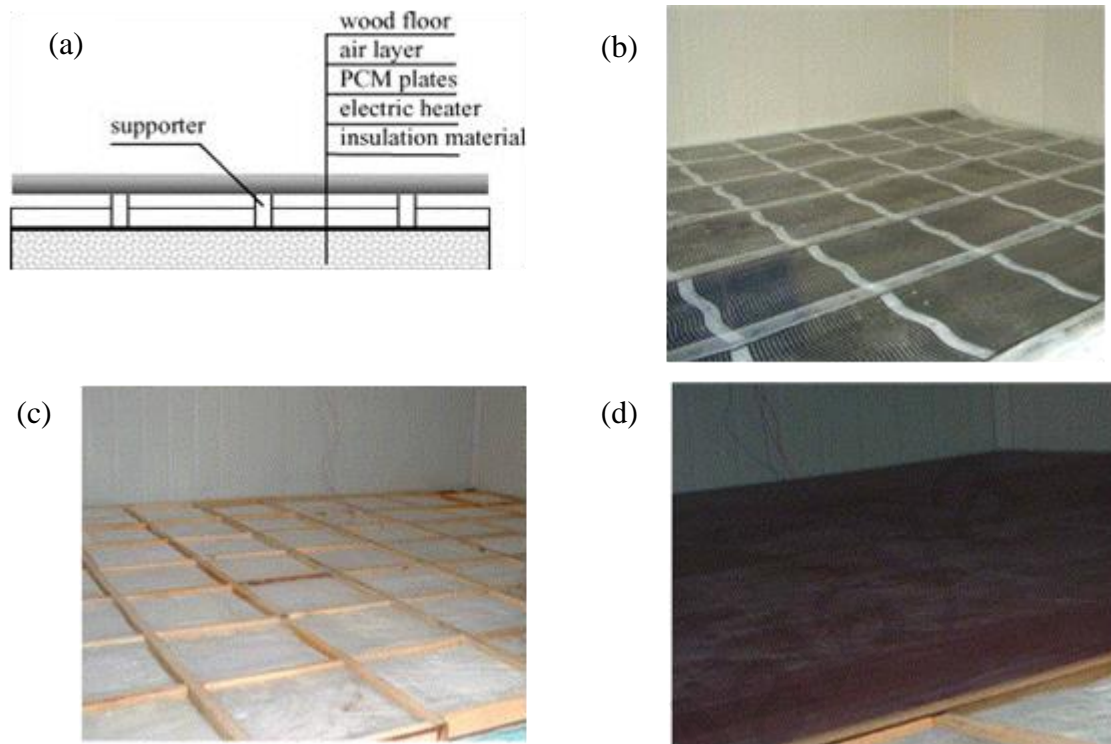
Under-floor electric heating system (a) Schematic of electric floor heating system with shape-stabilized PCM plates, (b) electric heaters, (c) shape-stabilized PCM plates, (d) wood floor (Lin et al., 2005).
